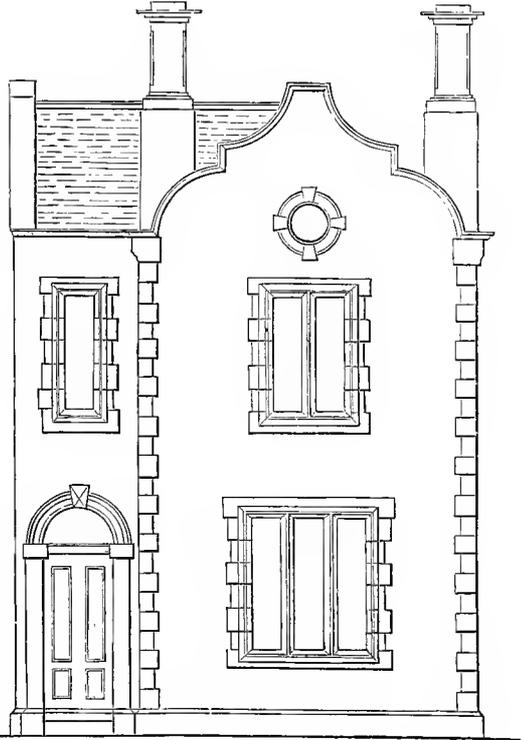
Front elevation of the two-storeyed cottage in fig. 738.
